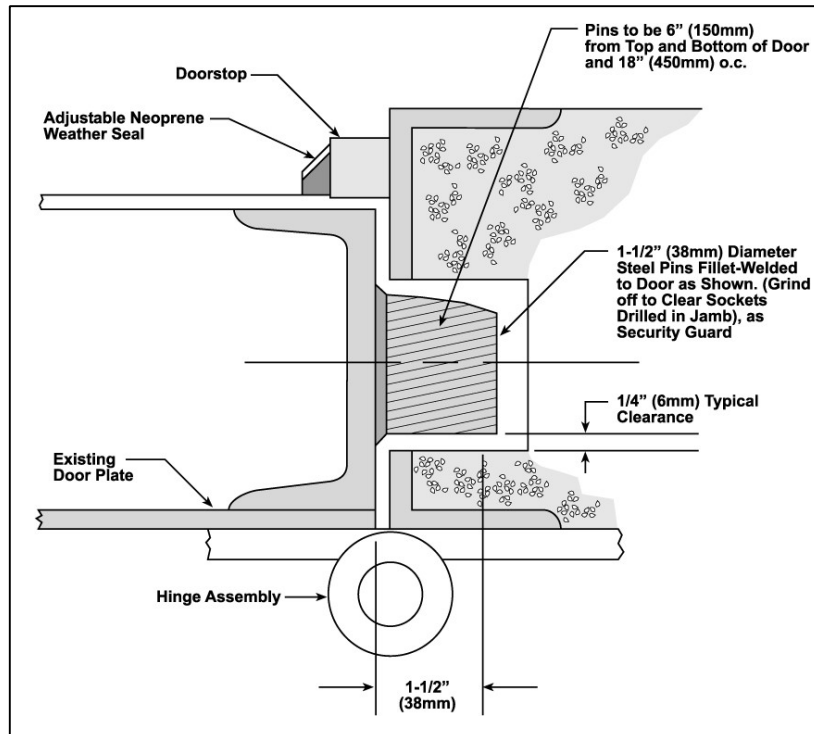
Hinge Side Protection Using a Forward Doorstop with Steel Angle
